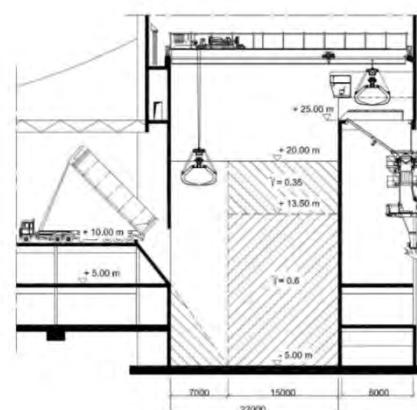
Waste Delivery (left) & Tipping area cross section (right)
